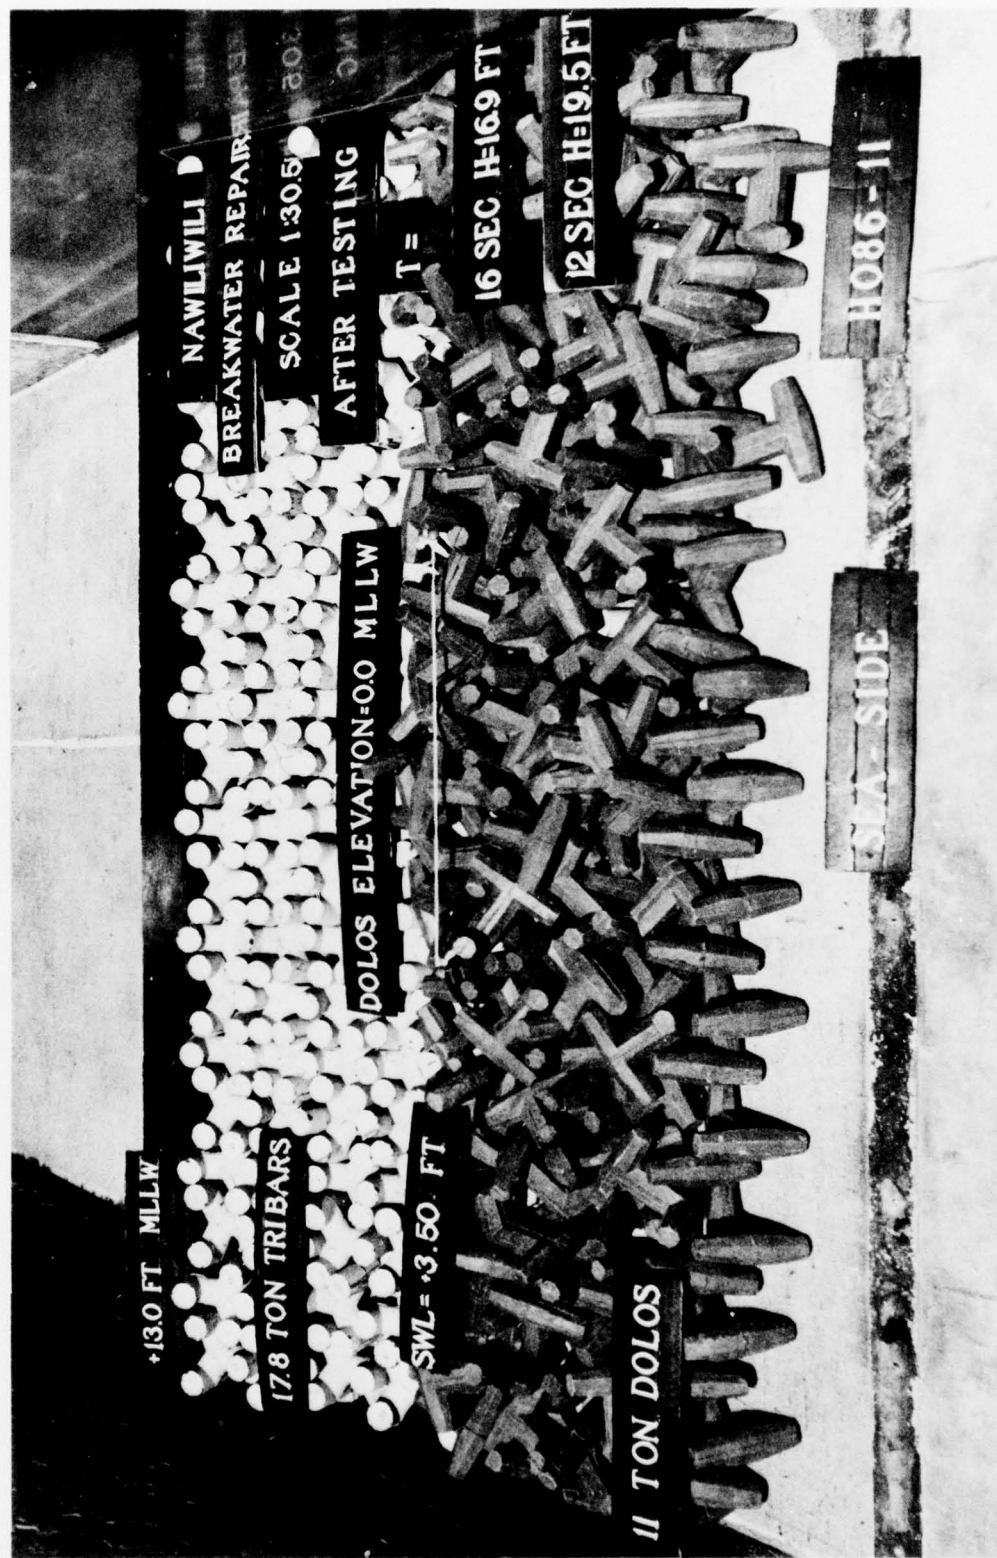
Sea-side view of test section 1A after testing with 16-sec, 16.9-ft and 12-sec, 19.5-ft waves at the +3.5 ft mllw swl
